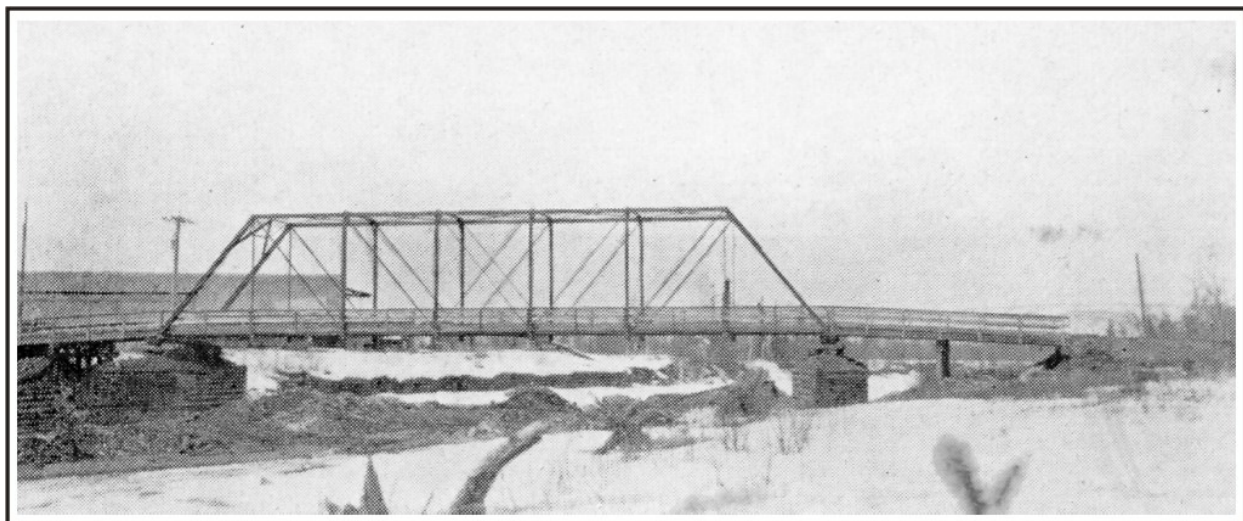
The Hot Springs Slough Howe timber truss bridge, October 24, 1938. U.S. Alaska Road Commission Collection, PCA 61-12-468, Alaska State Library.
